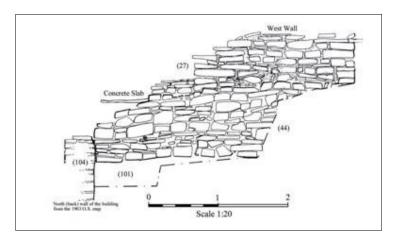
The east wall of the burial ground that butts the rear wall of a building associated with the tannery.
